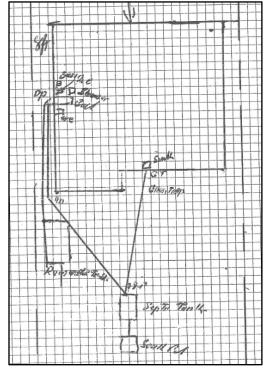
Original Drainage Plan (Source: KCDC Building File)
